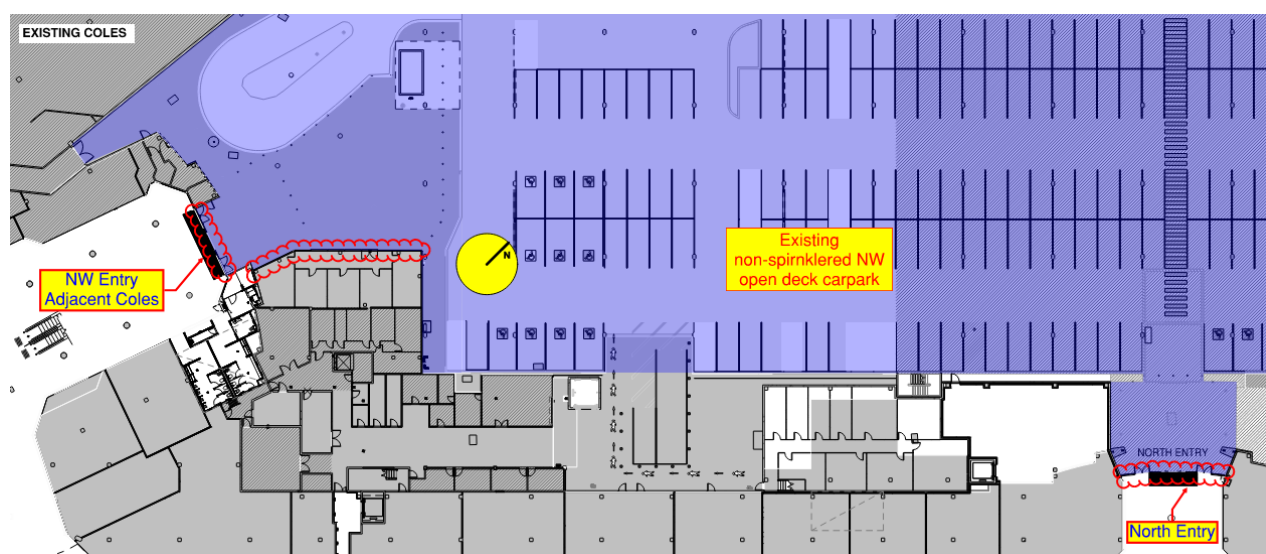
Locations where the walls between the sprinkler protected retail parts of the centre and the open-deck carpark that is not sprinkler protected have glazed sections
